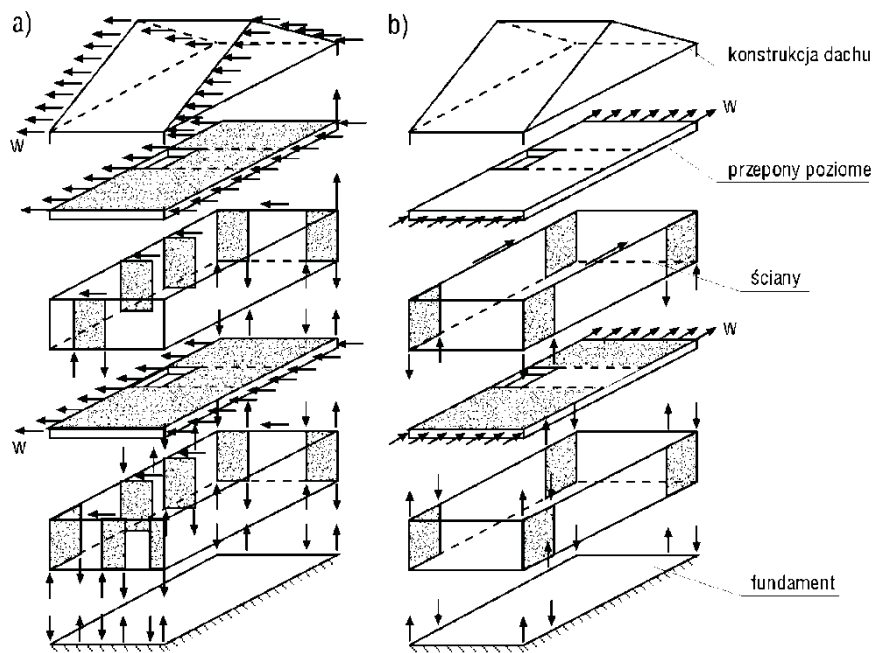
Redistribution of lateral loads to structural elements of building (Schulze et al. 1996), (Kuttinger et al. 1992): a) wind load to the longitudinal wall, b) wind load to the transversal wall.
